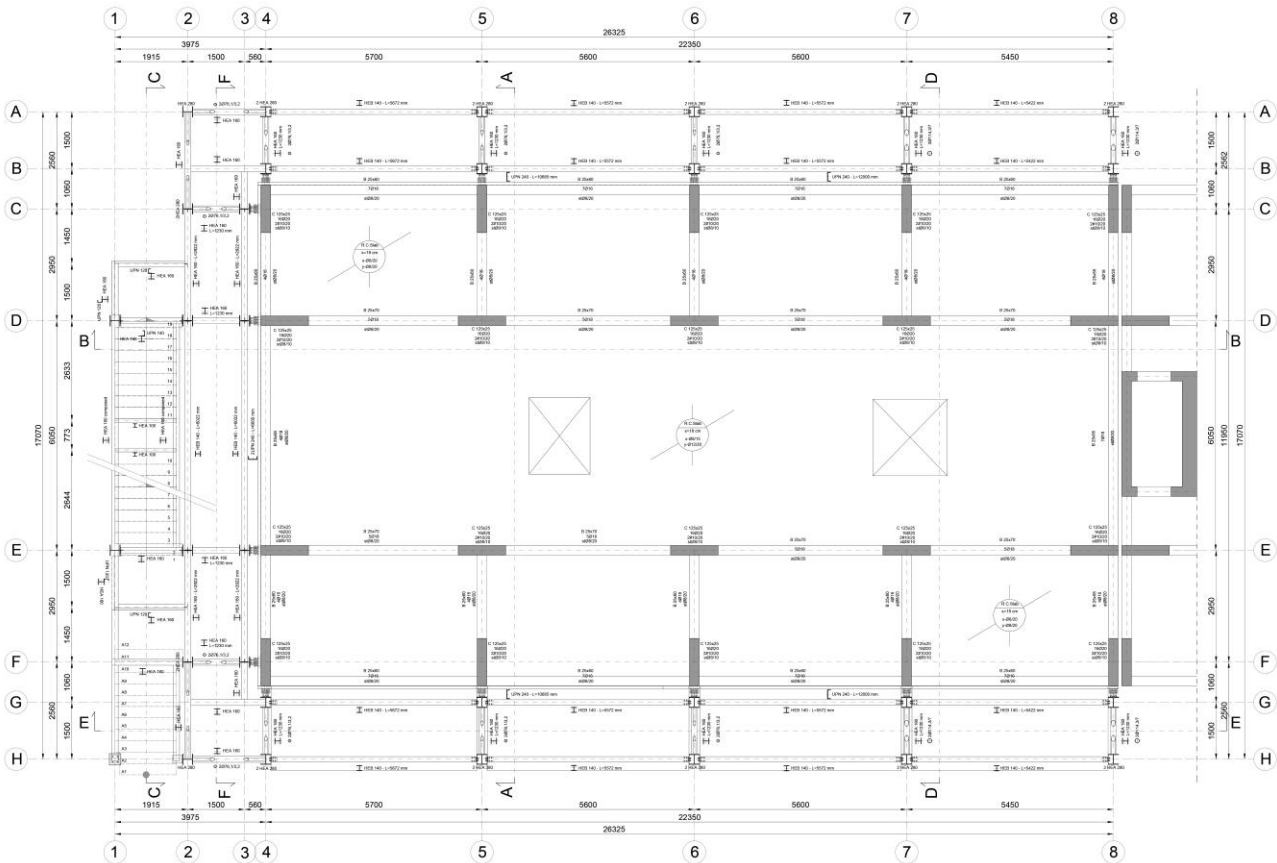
Typical plan of the steel exoskeleton applied to the Athens case study
